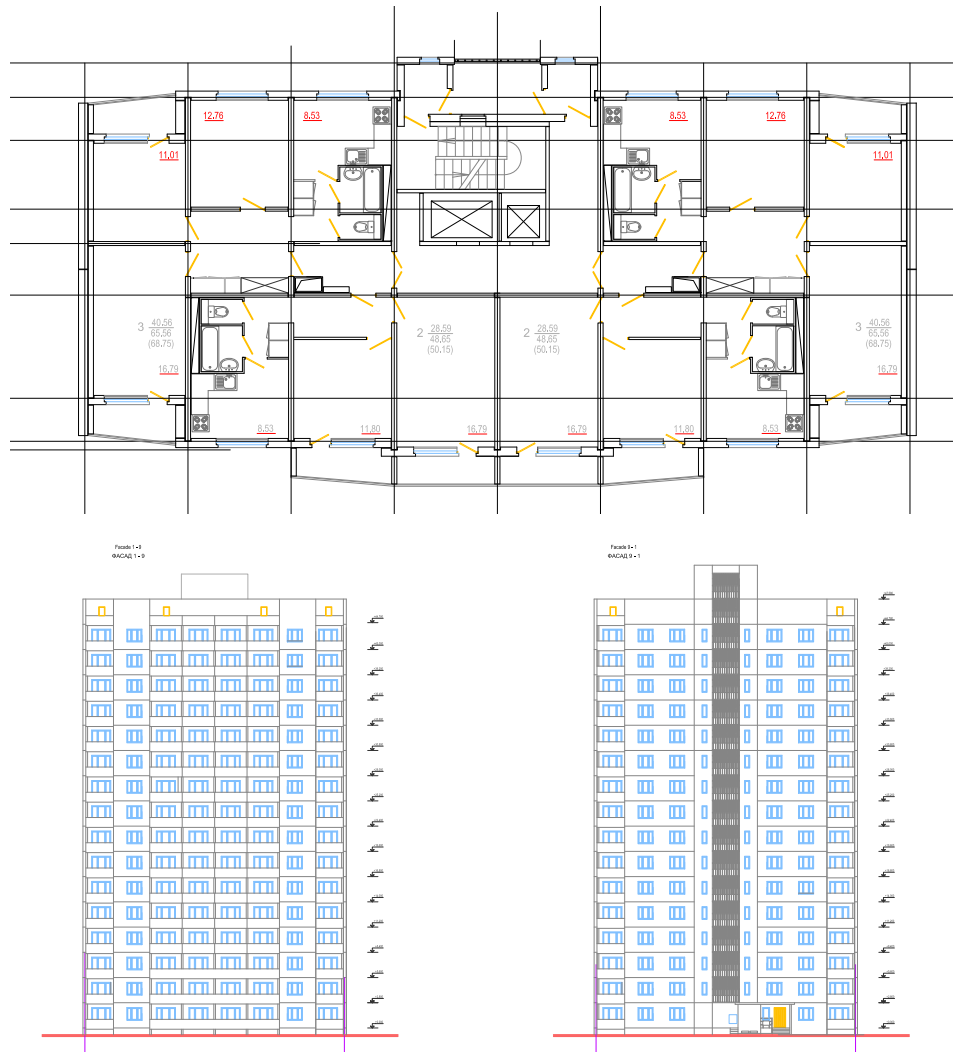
, Plan and facade of residential building at 82 Nataliia Uzhvii Street, Kharkiv, Ukraine.
